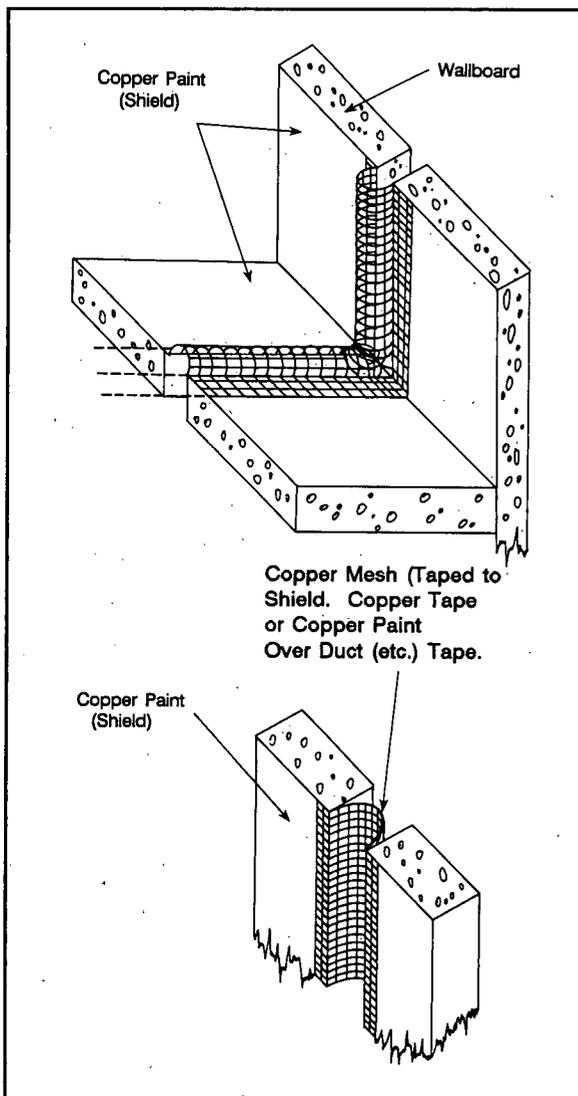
Expansion Joint in Edge Angle; External/Internal Joint.
